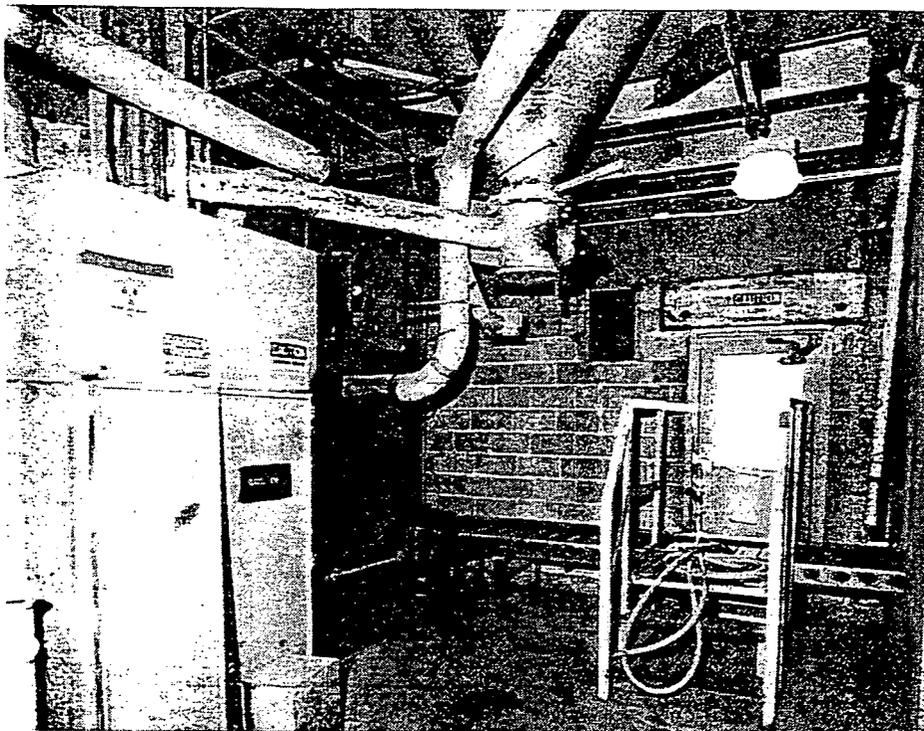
Building 1A - Feed Hopper, South Wall
